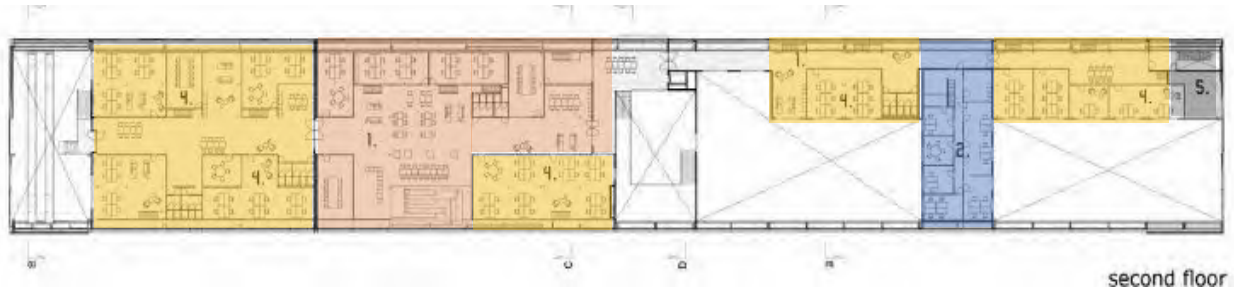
Werk Spoor Fabriek Second Floor: Source (Author)
